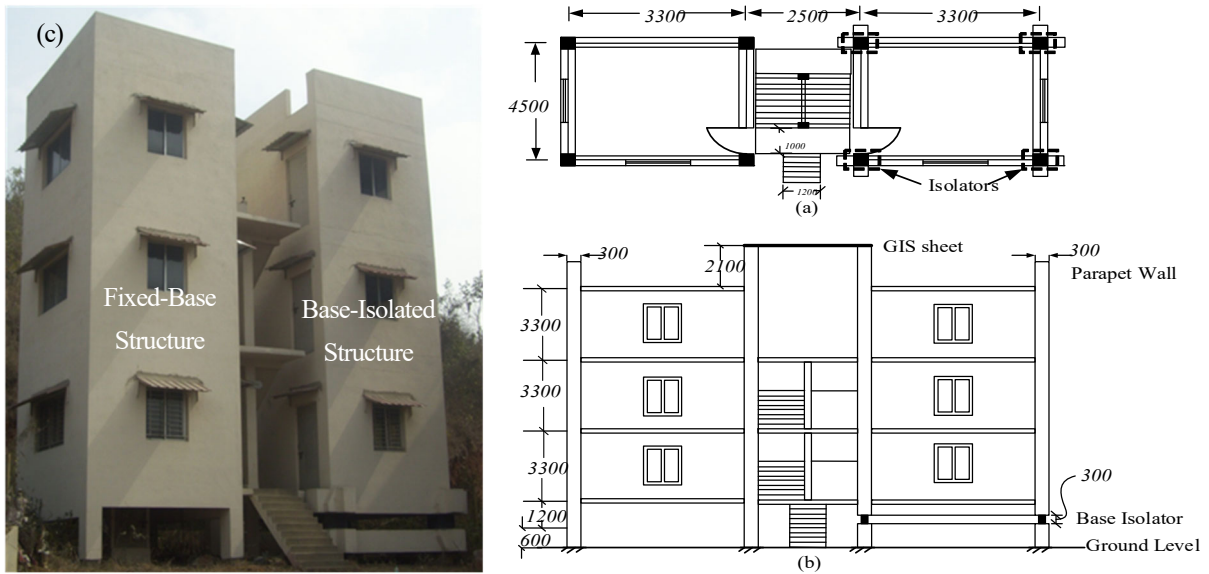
(a) Architectural Details (b) Sectional Elevation and (c) Pictorial View of Structures at IIT Guwahati Campus
